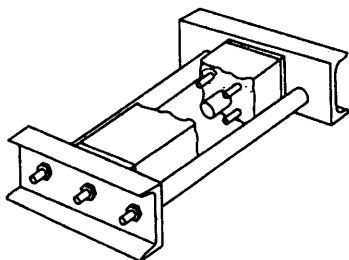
Restrained shrinkage test: Restraints applied using bar embedded in the specimen (Pan et al. 1987).
